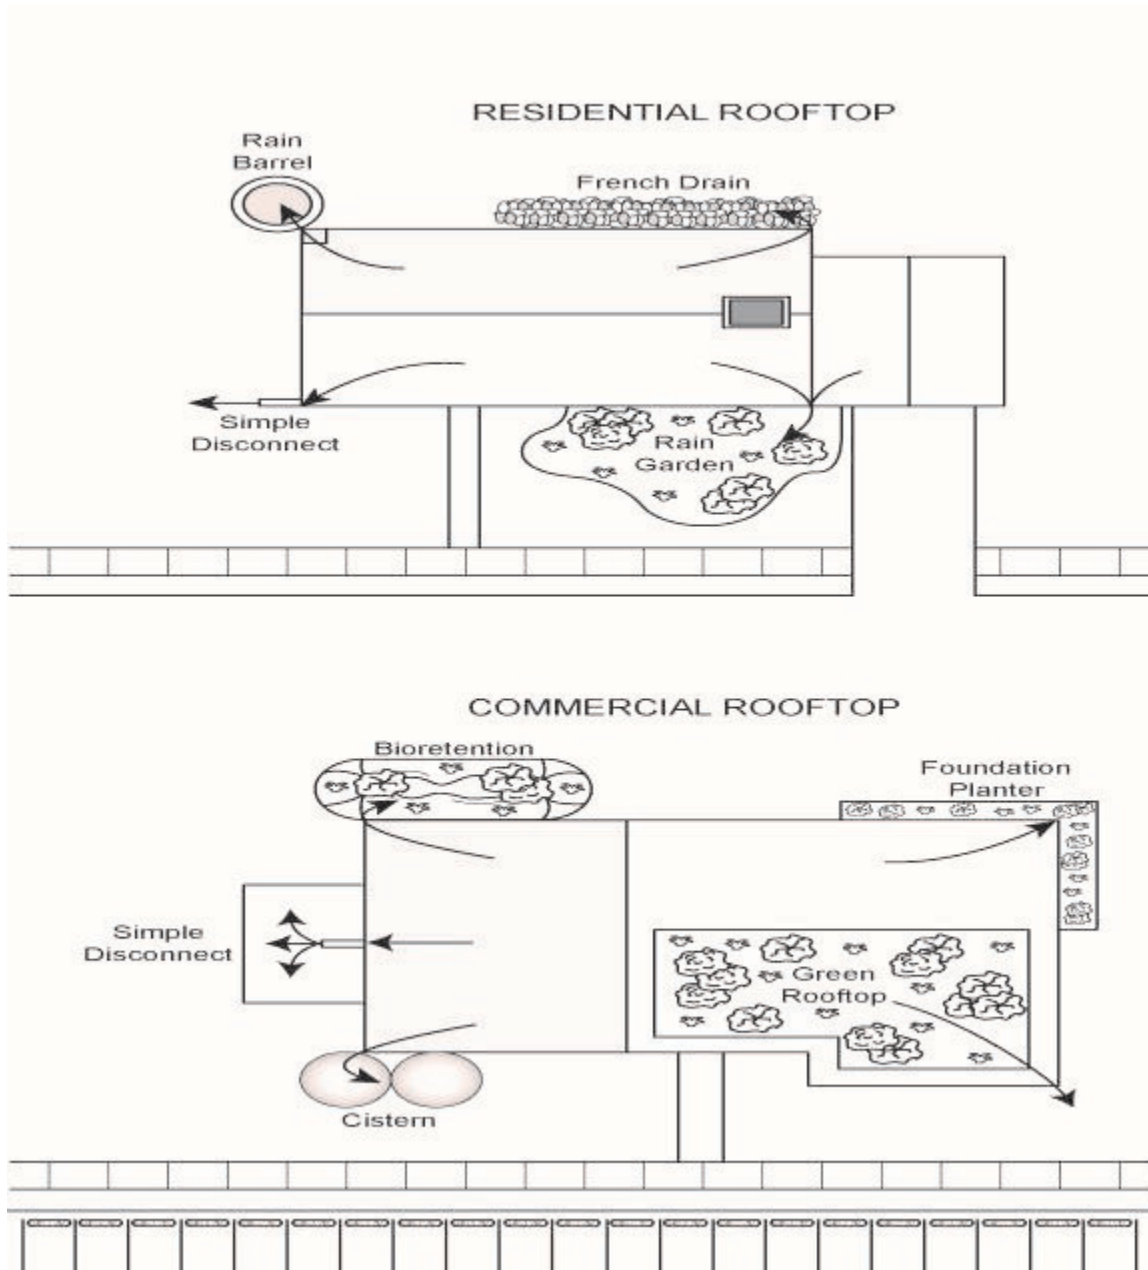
Roof Disconnection and Alternative BMPs.
